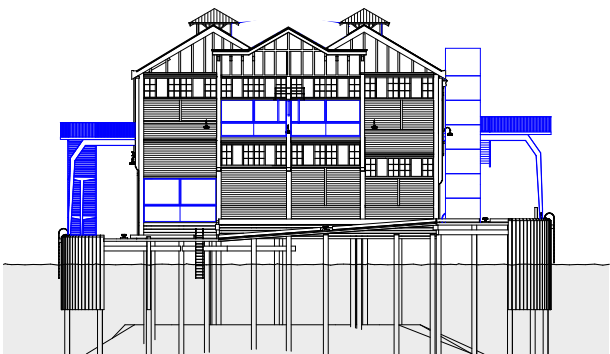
Proposed north elevation Pier 2/3, (alterations shown in blue).
